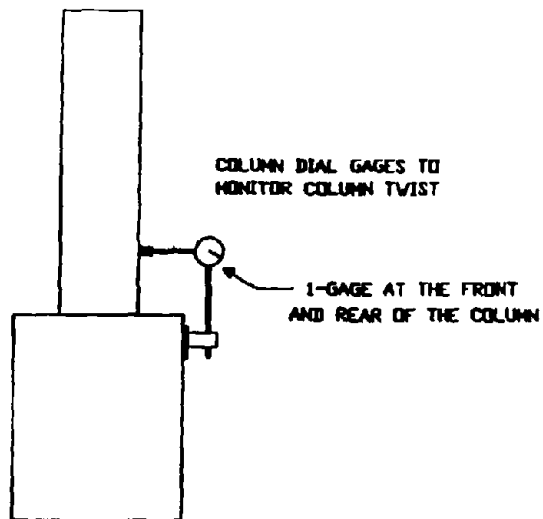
Instrumentation Detail for Measuring Column Twist.
